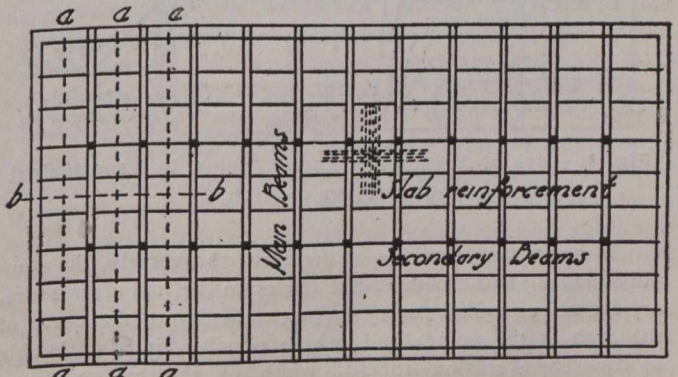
Main Beams With Column Supports; Second Beams—Planes on Centre Lines of Slabs, Parallel to Main Beams; also at Centre of Middle Span.
